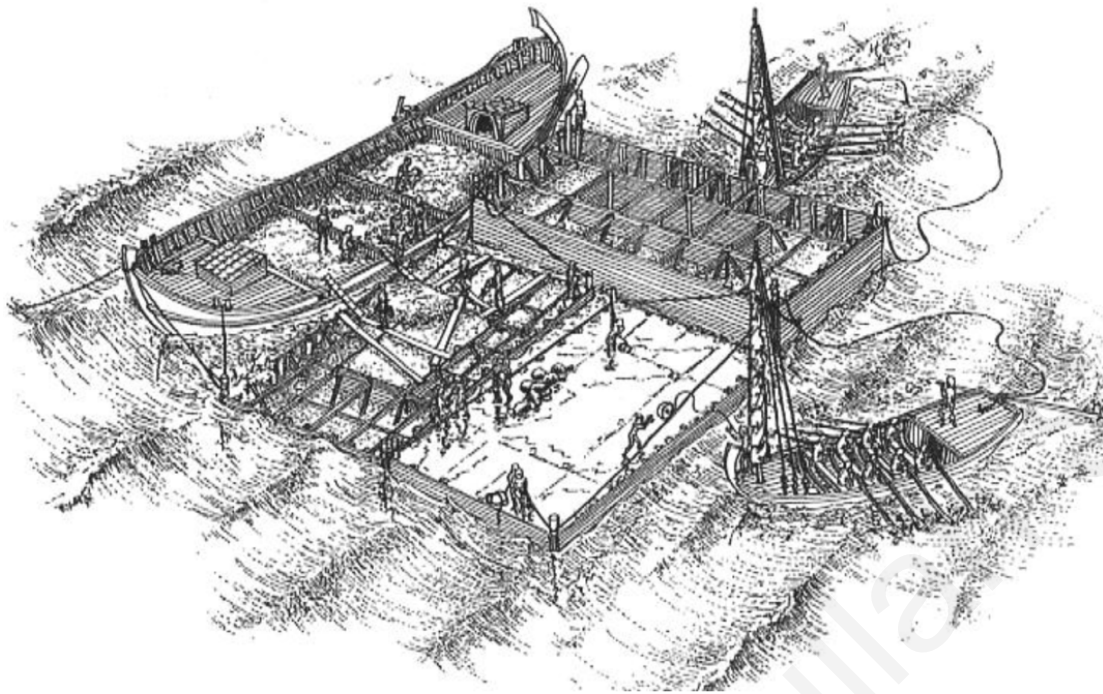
A hypothetical reconstruction of floating caissons filled by concrete (Brandon, 1996, 37).
